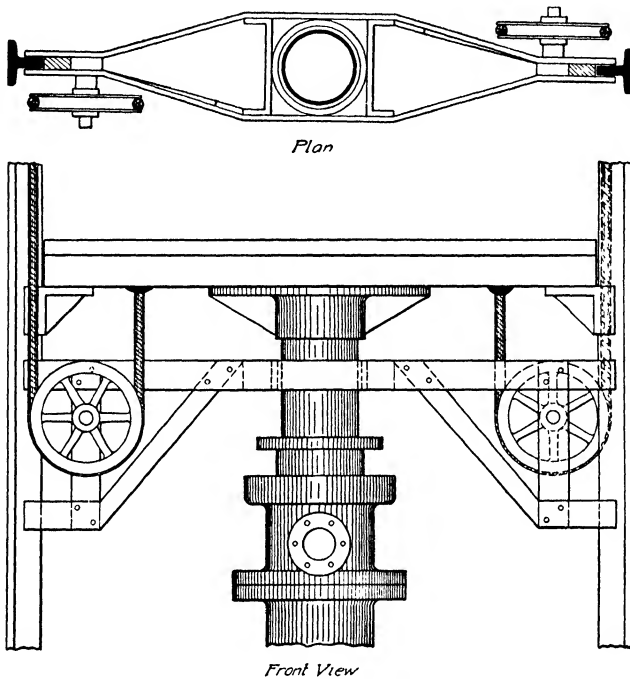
Hydraulic Elevator Plunger with Traveling Stay
